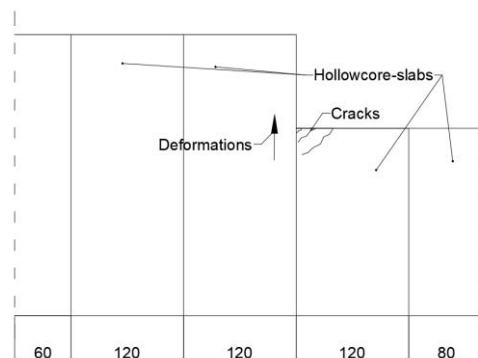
Top view of floorplan: cracking at change in layout of floor plan.
